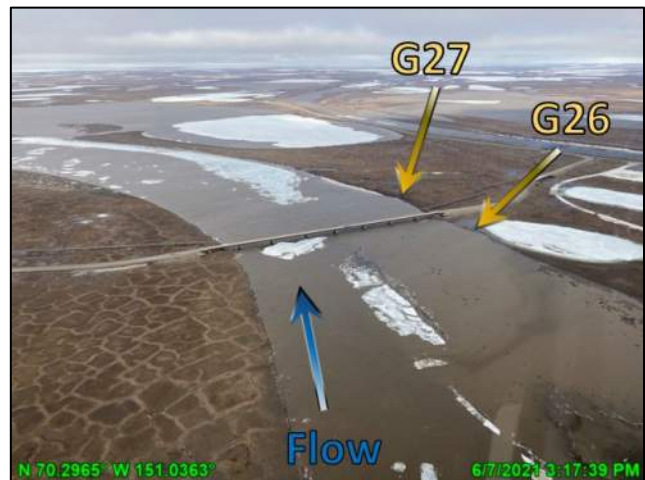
Peak conditions at the Nigliq bridge with no overbank flooding, looking northeast (downstream); June 7, 2021
